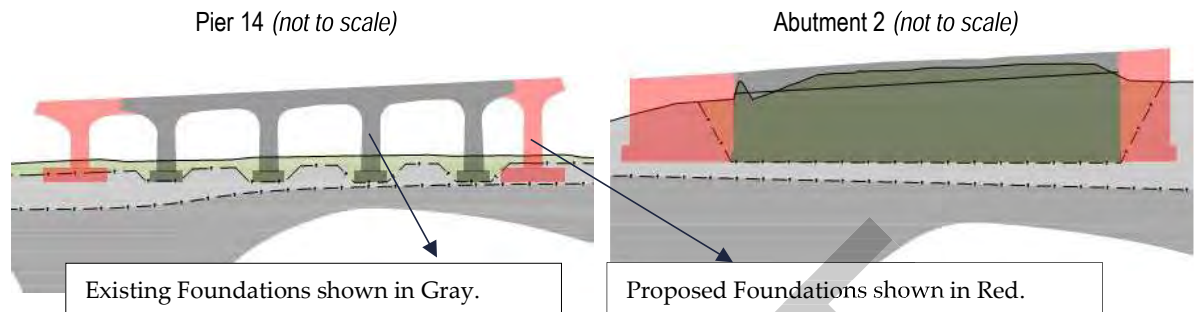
Illustrations of Proposed Spread Footing Foundations for Retrofit and Widening. See Figure 2 for locations of the piers.
